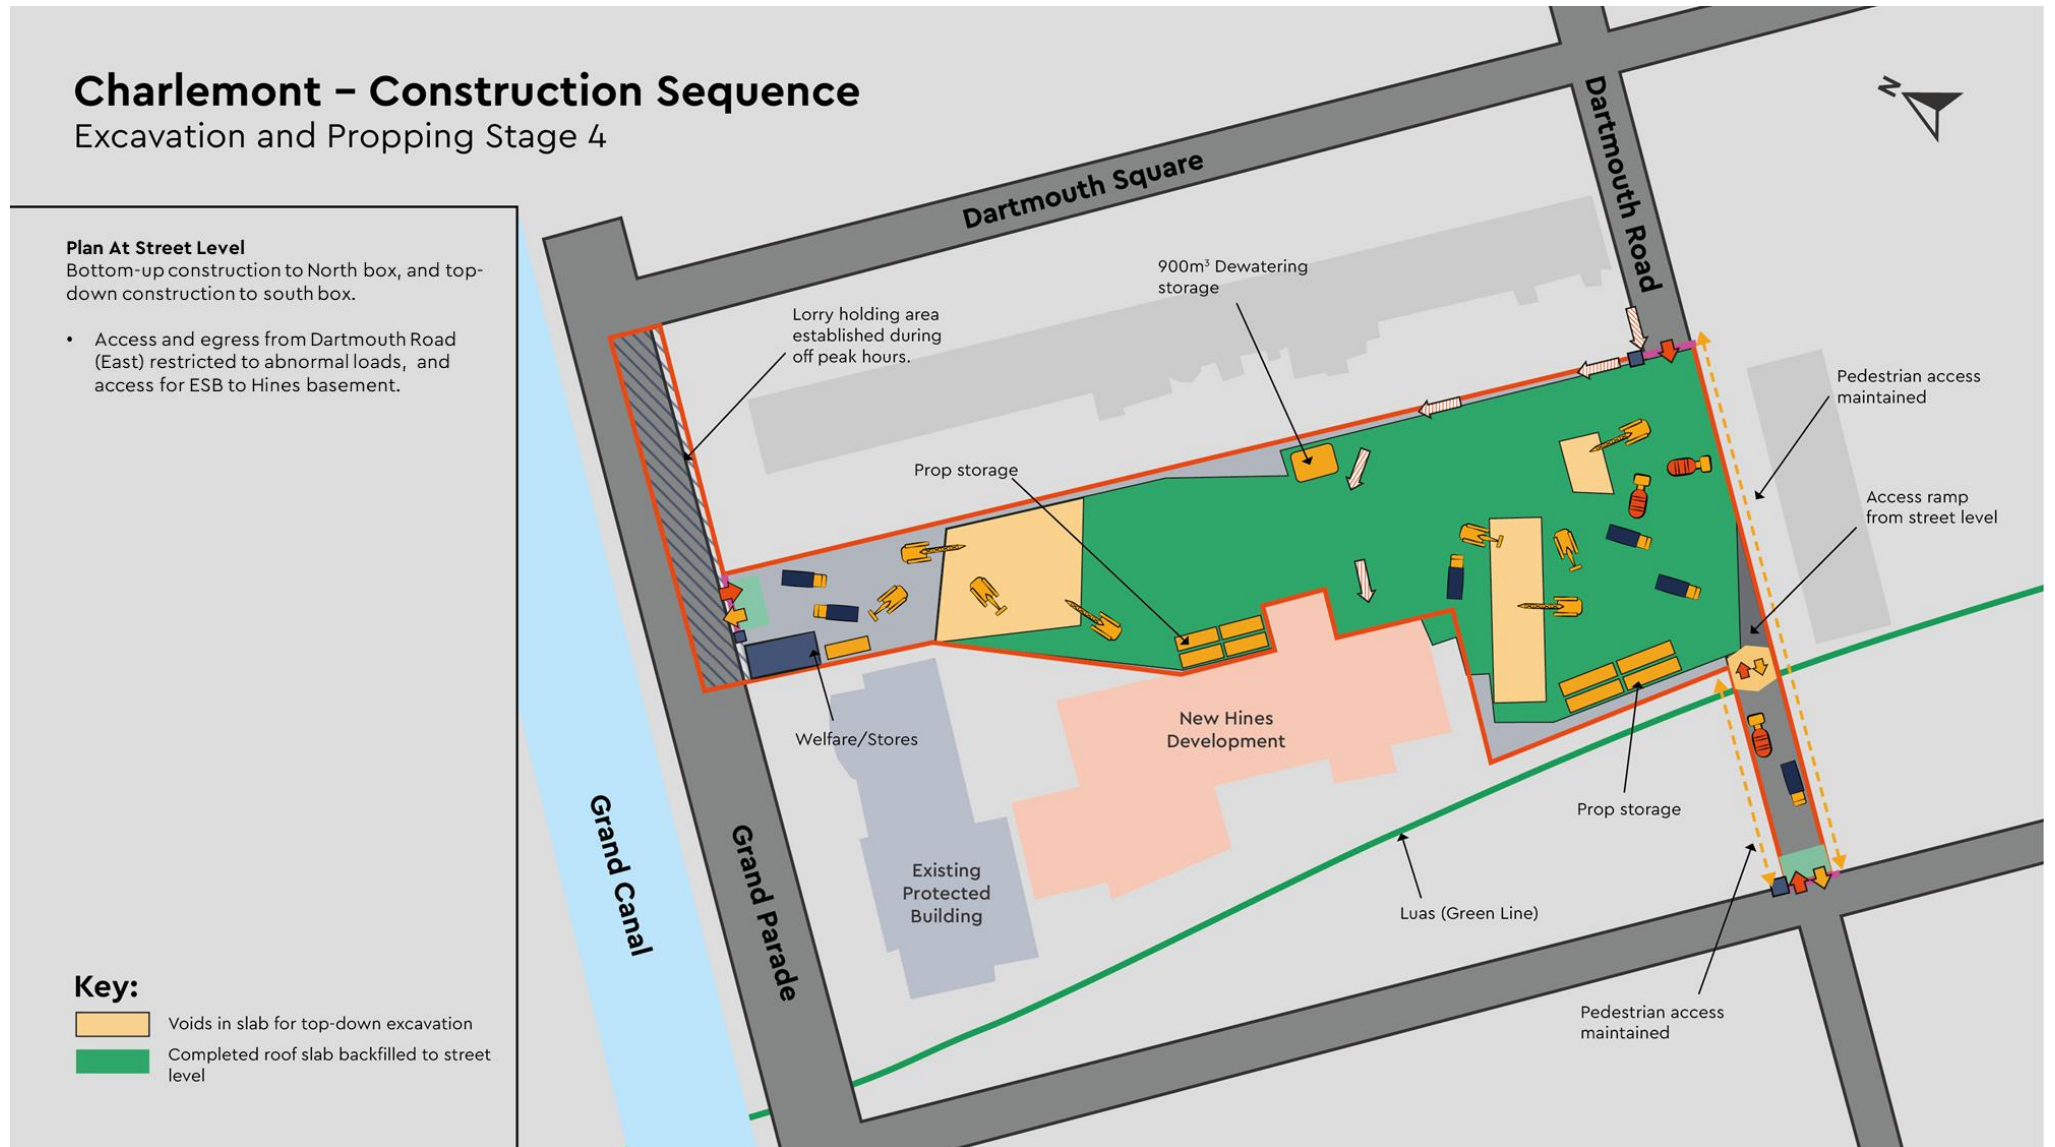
Charlemont Station - Stage 4 Excavation and Propping
